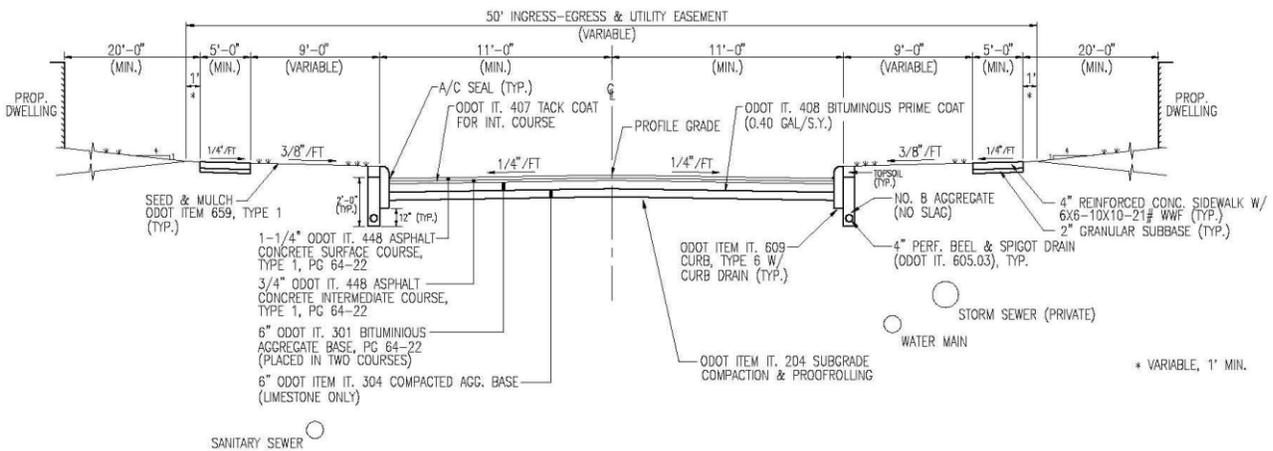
TYPICAL PRIVATE DRIVE SECTION (ALTERNATE - ASPHALT W/ CURB)
